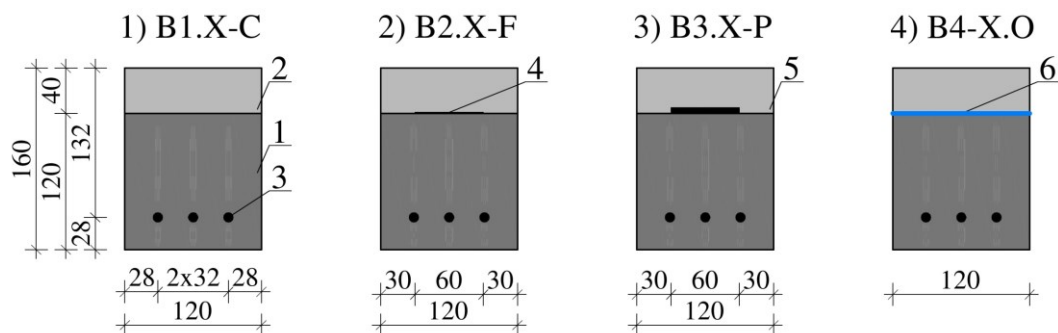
Initial test beam cross-section: 1- precast, 2- overlay, 3- strands, 4- PE foil, 5- PVC mat, 6- antiadhesion agent
